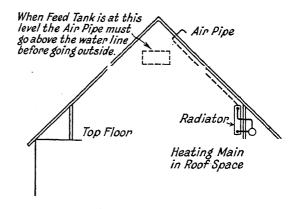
Drop system horizontal main in small roof space on top floor level
